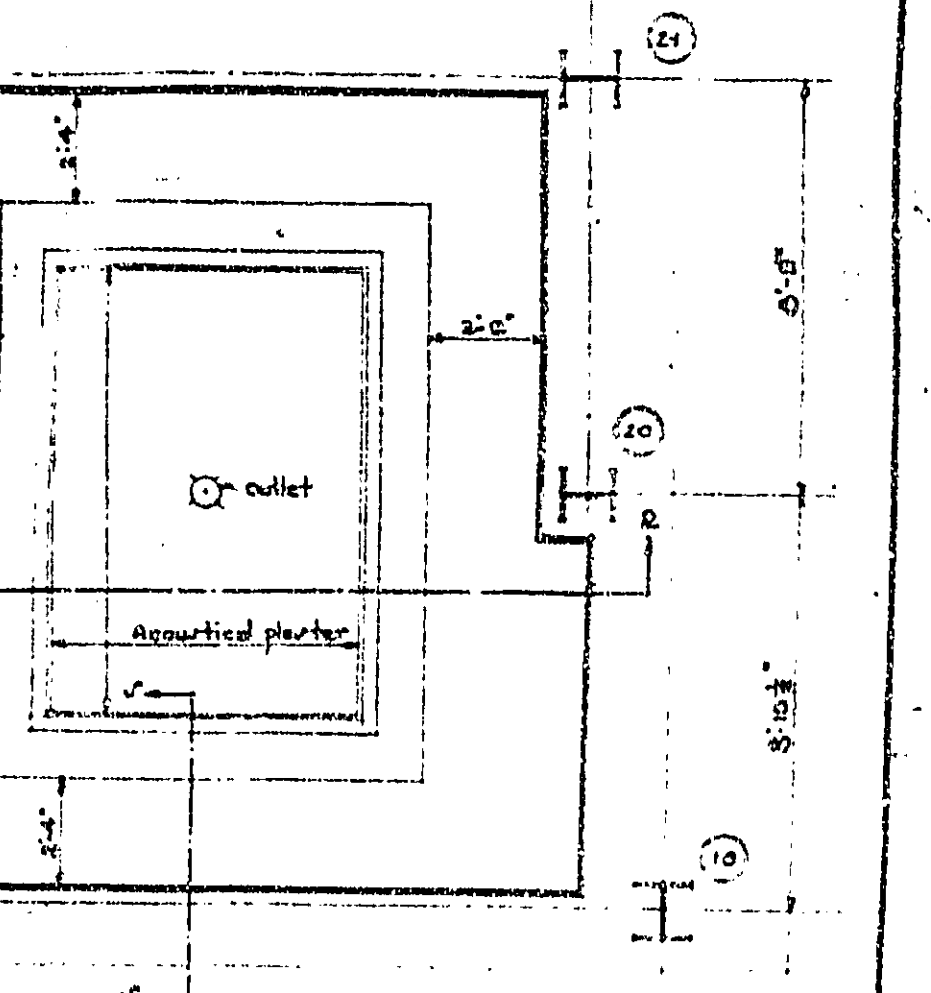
DETAIL SECTION OF CEILING AT JUNCTION Scale: 1/4" = 1'-0"
